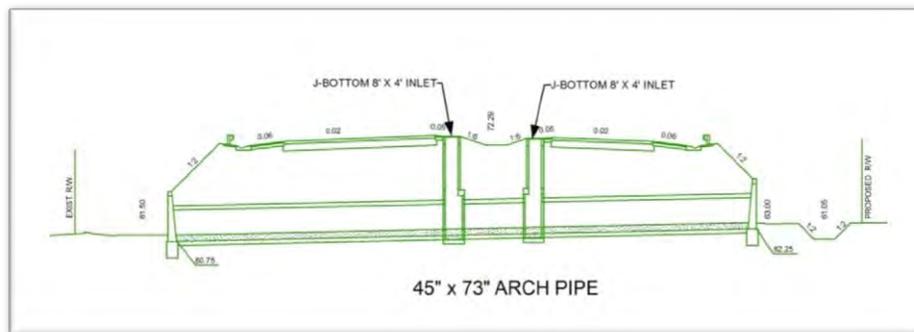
Arch Pipe Showing Ditch Bottom Inlets
